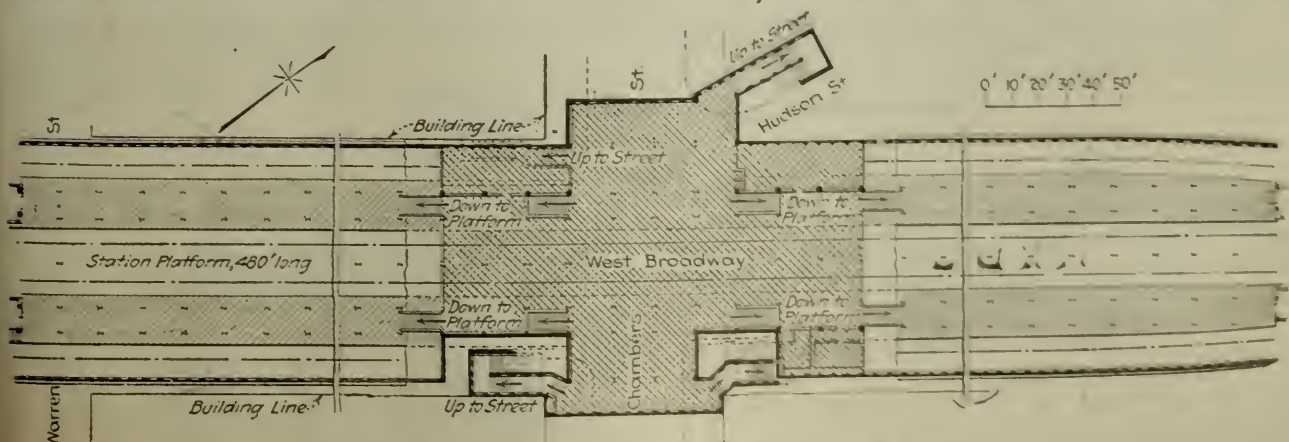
CHAMBERS STREET STATION, NEW YORK SUBWAY
